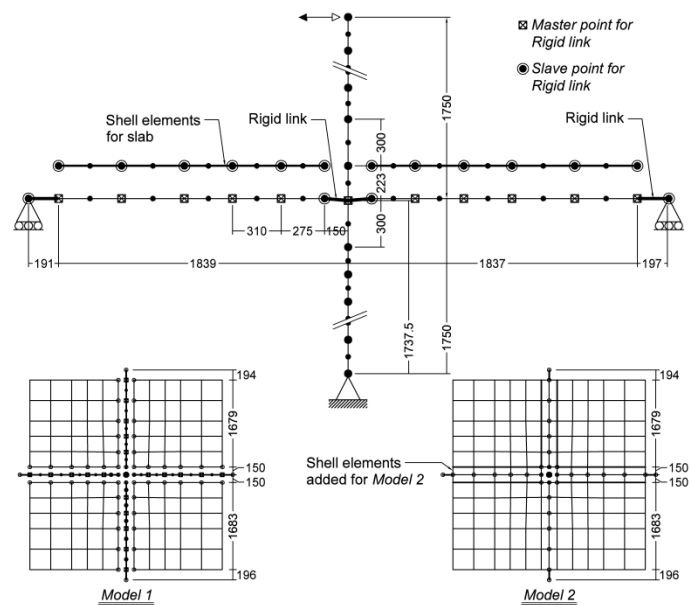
Details of finite element models for unit 2D-I (dimensions are in mm).
